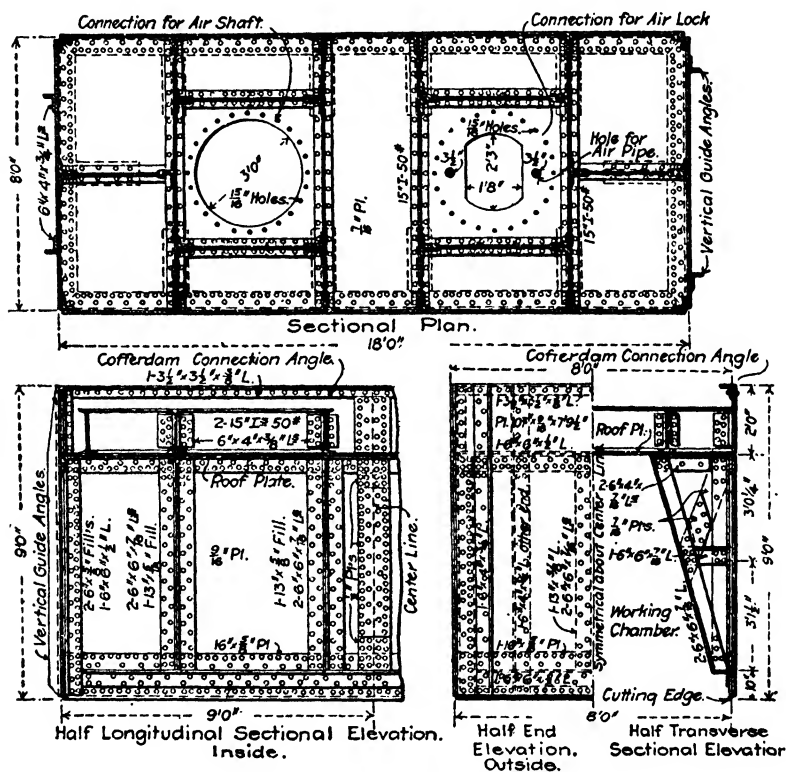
Caisson for Wall Column, Mutual Life Building, New York.
